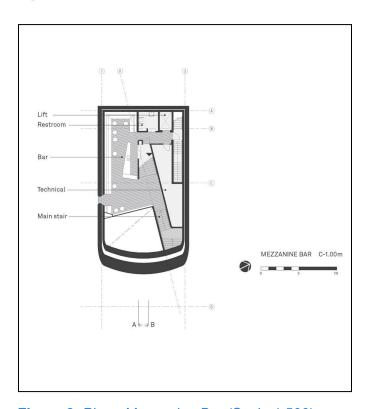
Plan - Mezzanine Bar (Scale 1:500)
